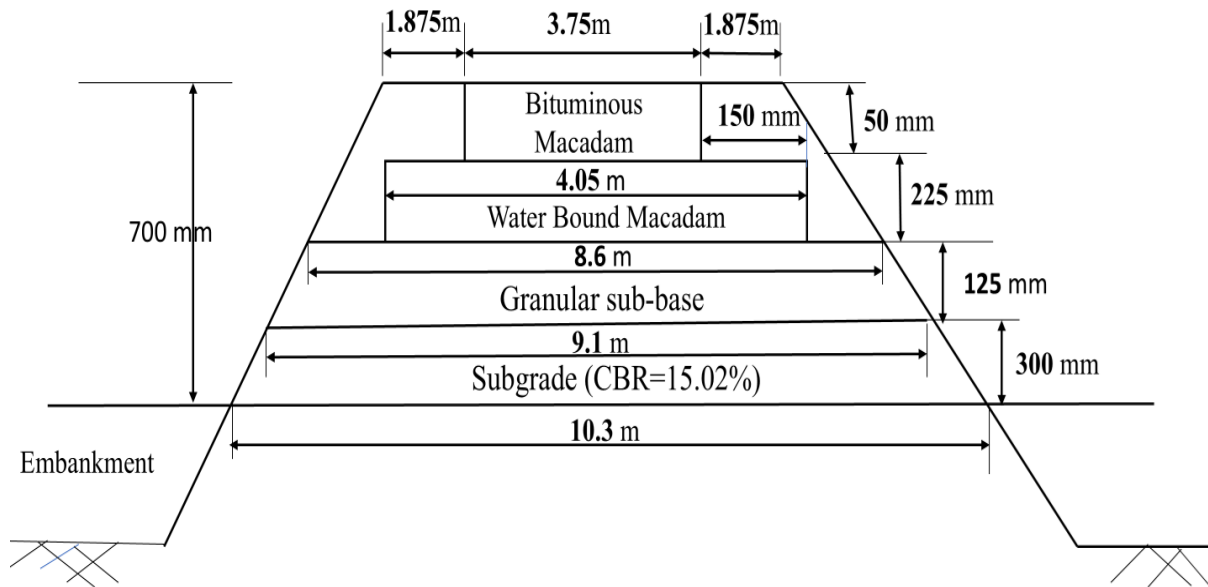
A typical cross section of pavement of Soil+1%NS+20%FA with 28 days of soaked CBR.
